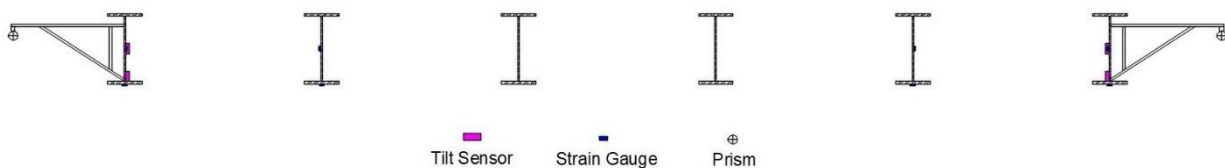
Locations of sensors at S1 and S3 for McDonough Bridge.
